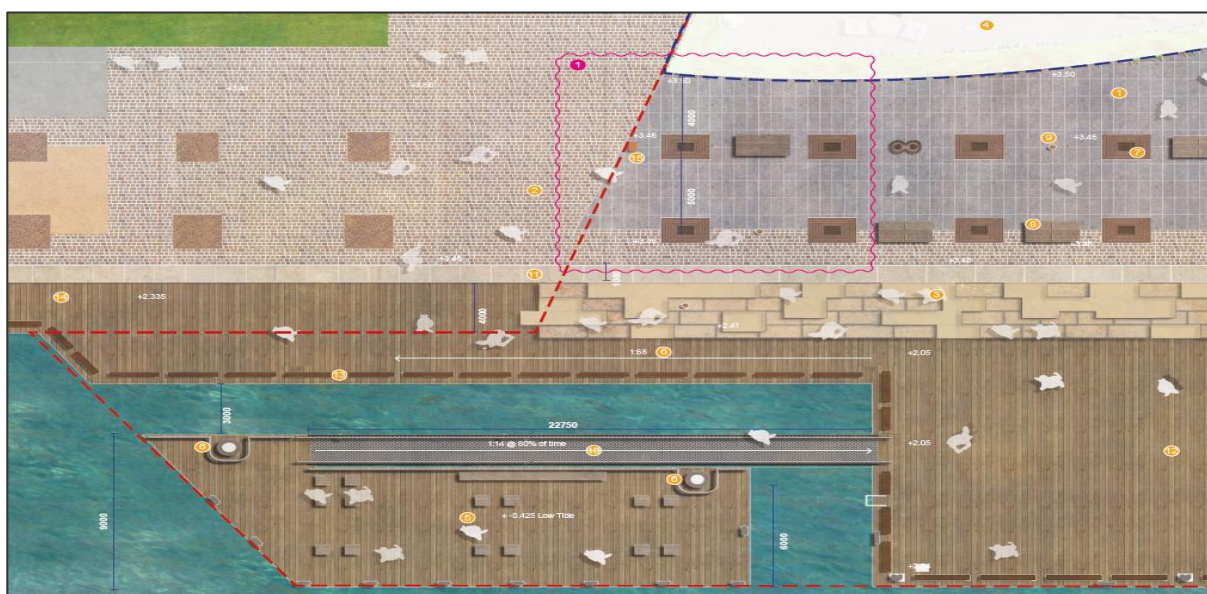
| Proposed removal of porphyry paving on Wulugul Walk identified as number 1 (Source: Applicant)
